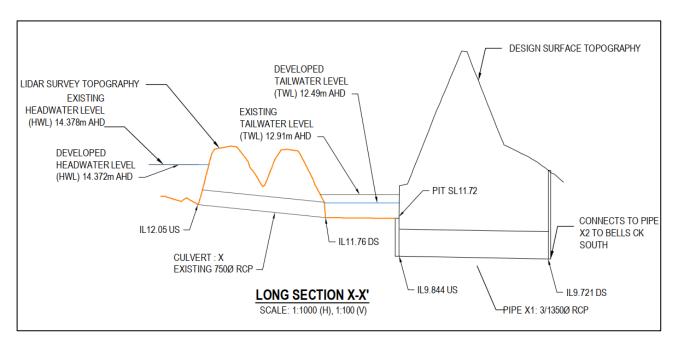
CULVERT X AND PIPE X1 LONGITUDINAL SECTION
